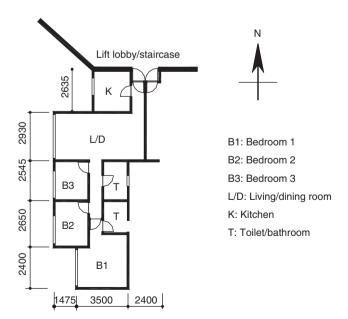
Floor plan of a west-facing apartment under study in a hypothetic high-rise residential building.
